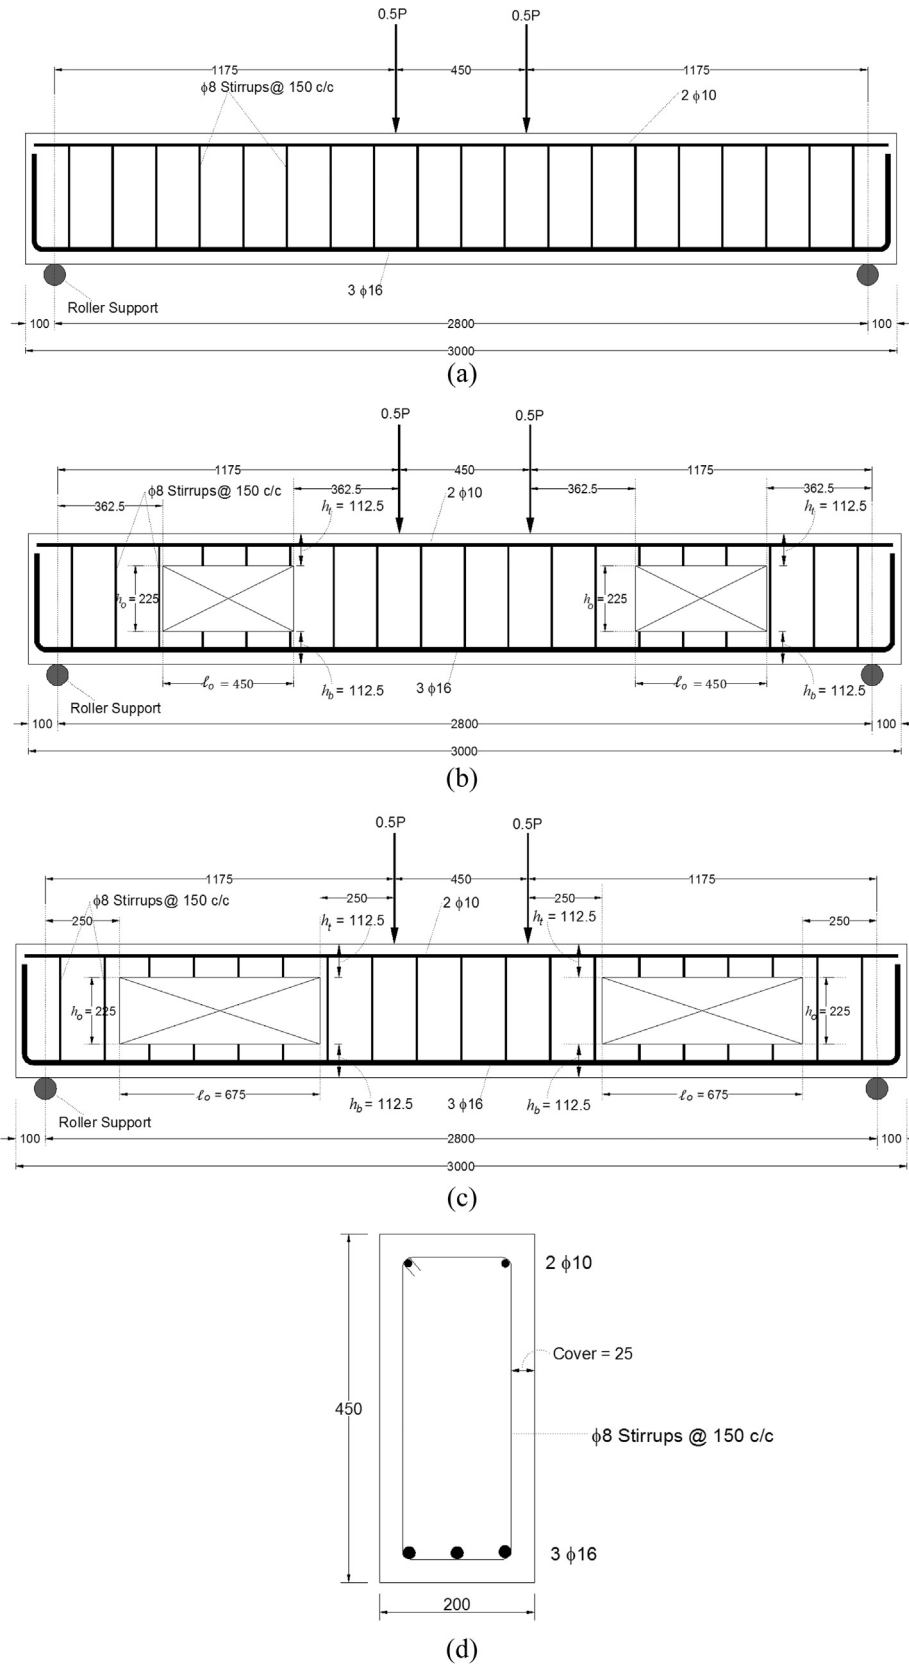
Details of unstrengthened beams (Note: All dimensions are in mm): (a) Elevation of control beam BC-N; (b) Elevation of beam BC-O1; (c) Elevation of beam BC-O2; (d) Beam section.
